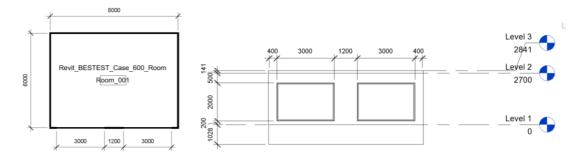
REVIT BIM MODEL – BESTEST CASE 600 – BASE CASE LOW MASS BUILDING – LEFT: FLOOR PLAN VIEW. RIGHT: SOUTH ELEVATION VIEW
